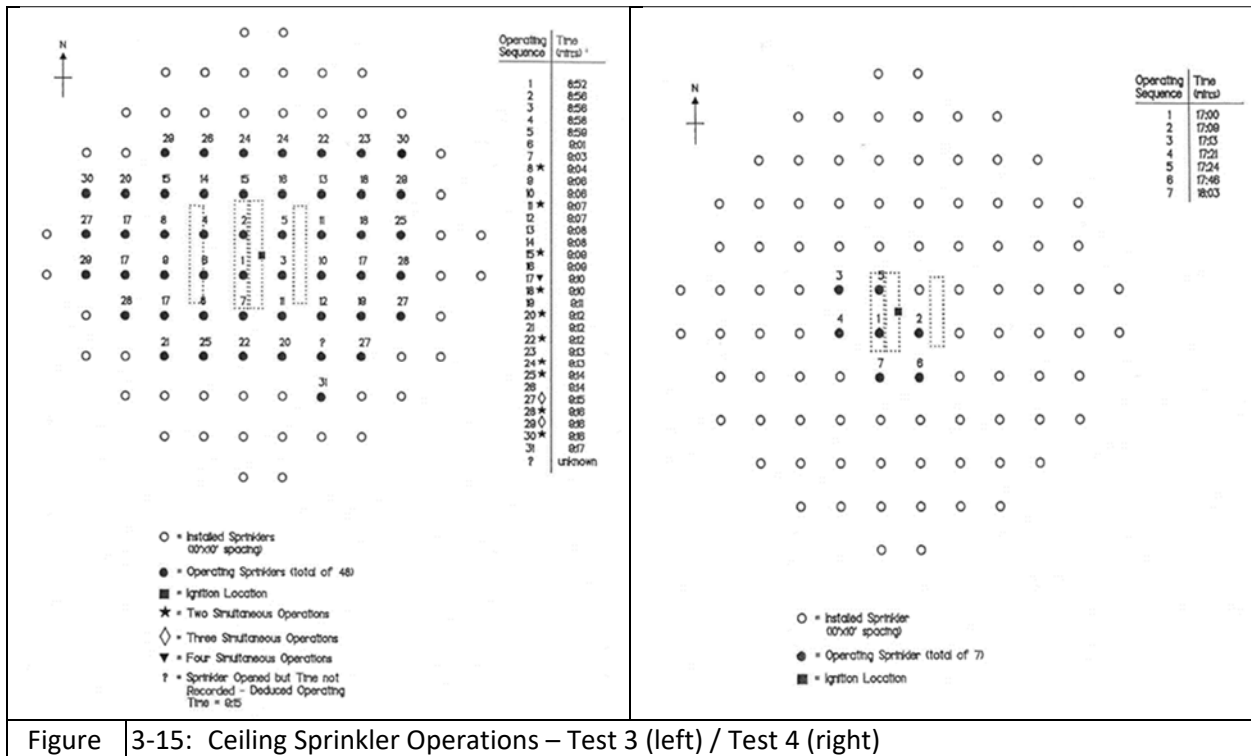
Ceiling Sprinkler Operations – Test 3 (left) / Test 4 (right)
